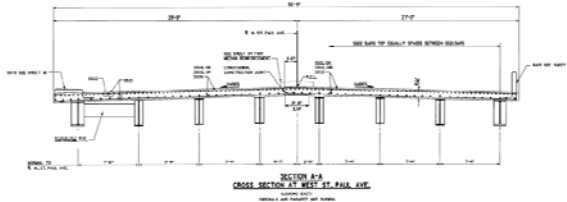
Bridge B-67-134/135 Deck Cracking.
